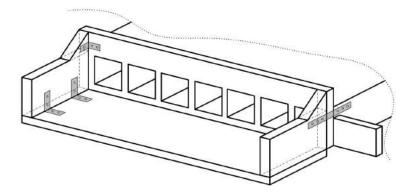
Retrofitting of the outlet walls and outlet slab using angle brackets. This figure is not to scale.
